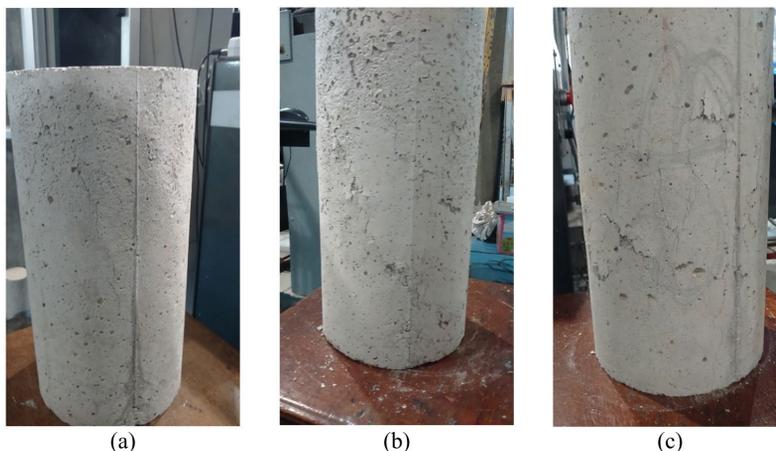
Examples of failure modes of reinforced concrete stub columns: a) CP1_30_2; b) CP1_90_3; c) CP2_120_3.
